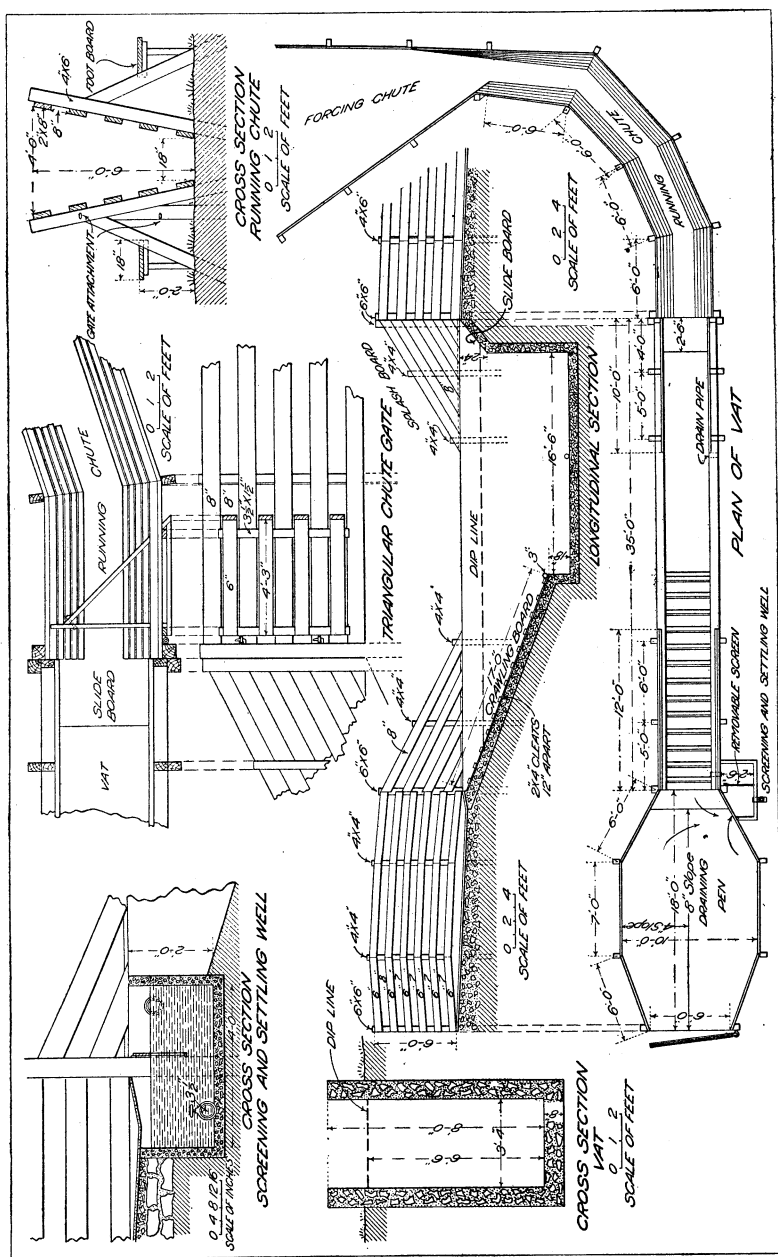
Plan of cattle-dipping plant with concrete vat.
